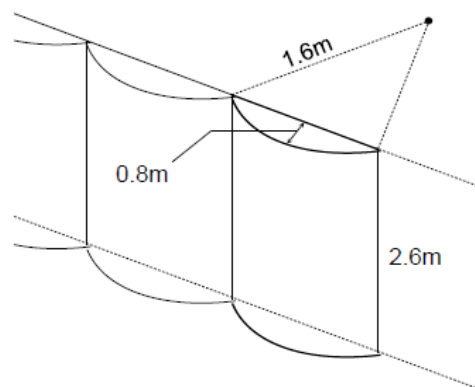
semi-cylinder diffusing element at ceiling walls A and B, which was planned in the original design.
